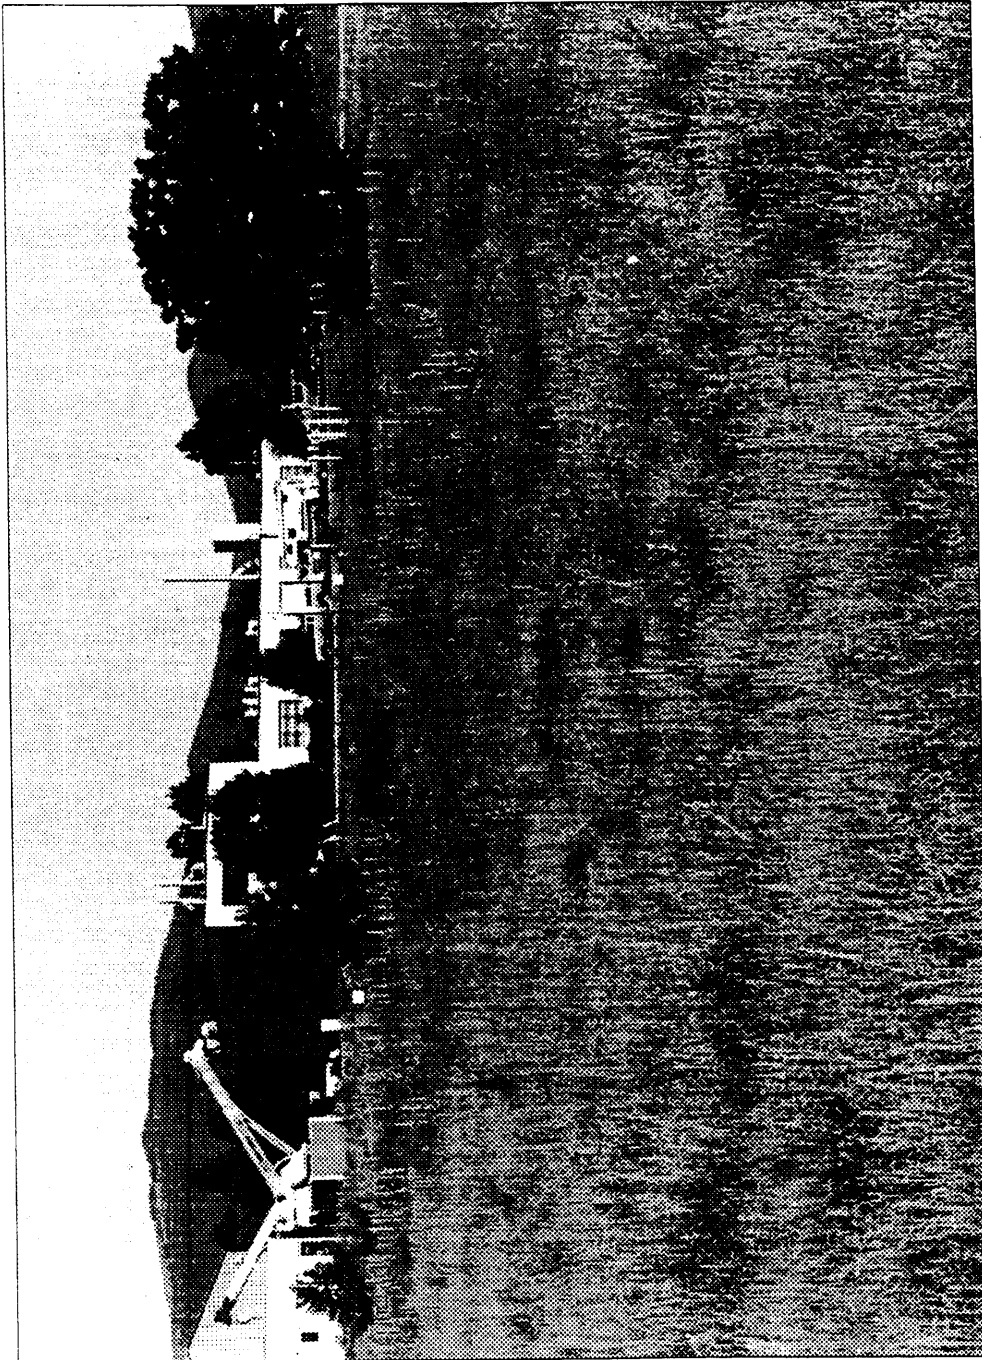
View of Firing Site A-B after it was regraded (photograph taken July 1992), looking northwest towards building R-183.
